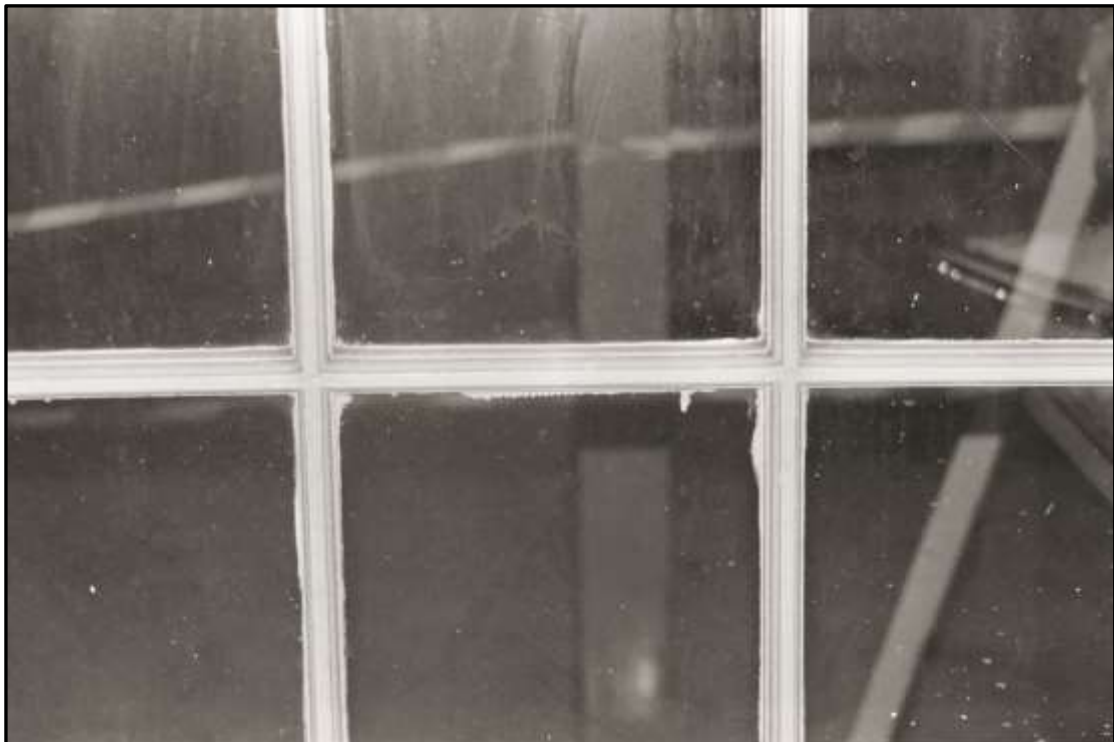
Typical glazing bar detail to metal casement windows to the ground floor
